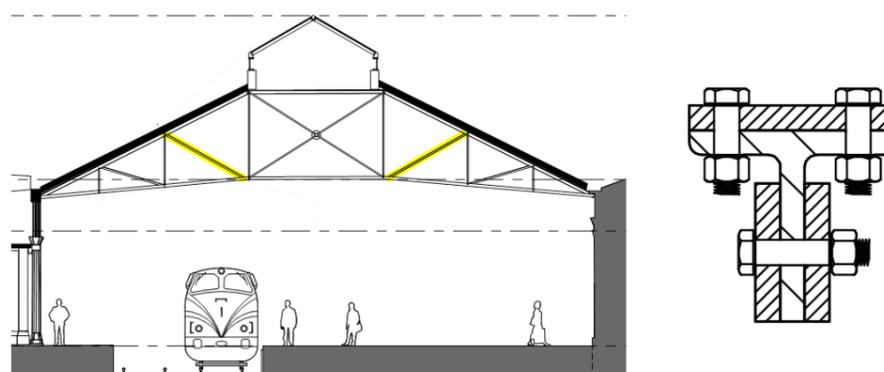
Strengthening detail to diagonal elements
